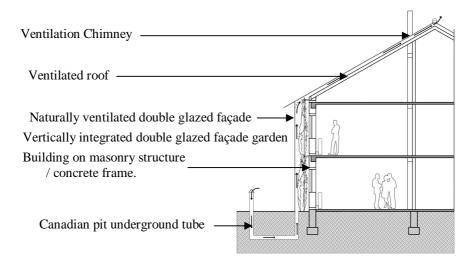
Ventilation scheme of a building through Canadian shaft connected to double glazed façade that includes a vertical garden and to a ventilated roof layer of air.
